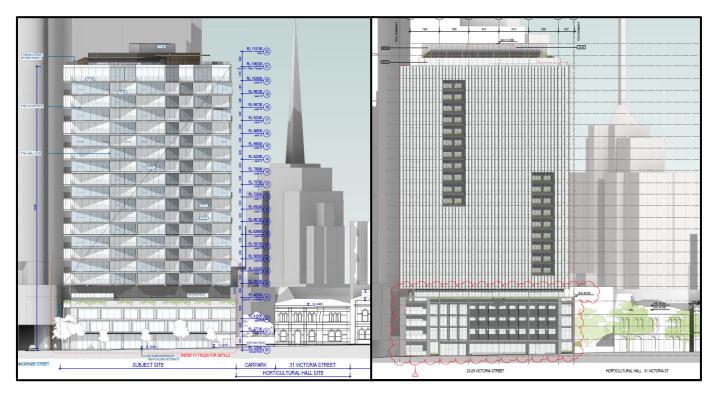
Excerpt from endorsed plans (left) and from S.57A amended plans (right) showing Victoria Street elevation
